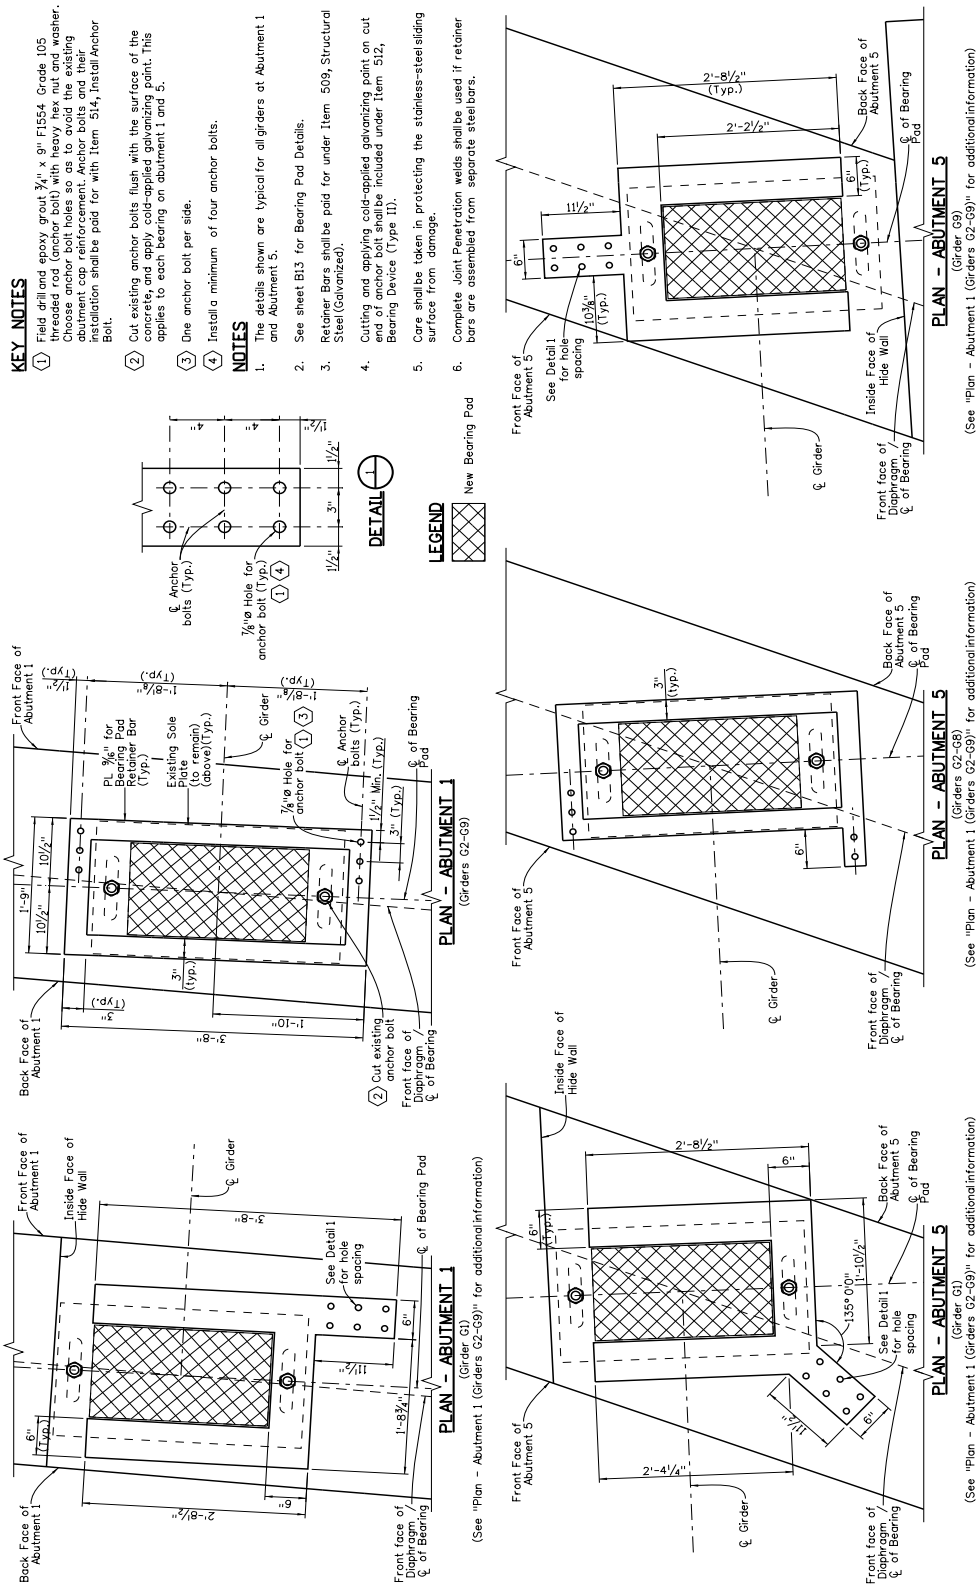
(M)-5 Sample Details for Bearing Keeper
